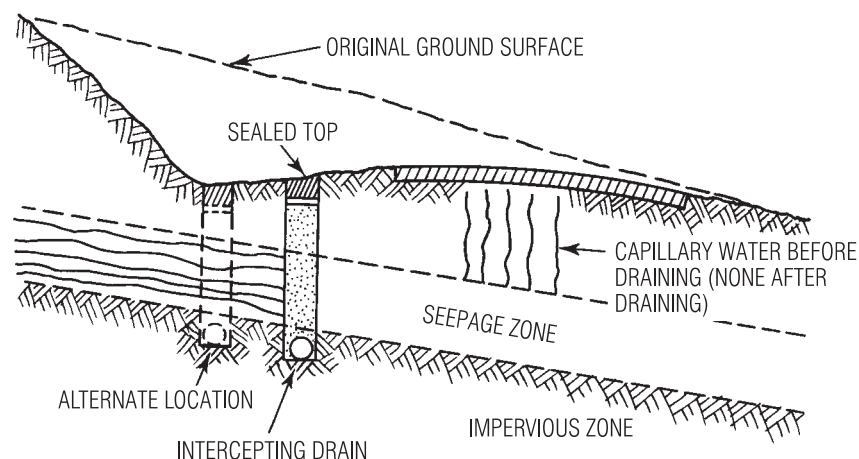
Drain intercepts source of supply of harmful capillary and free water under a road. Top of trench is sealed to prevent silting. (*Handbook of Drainage and Construction Products*, Metal Products Division, Armco Steel Corp.)
